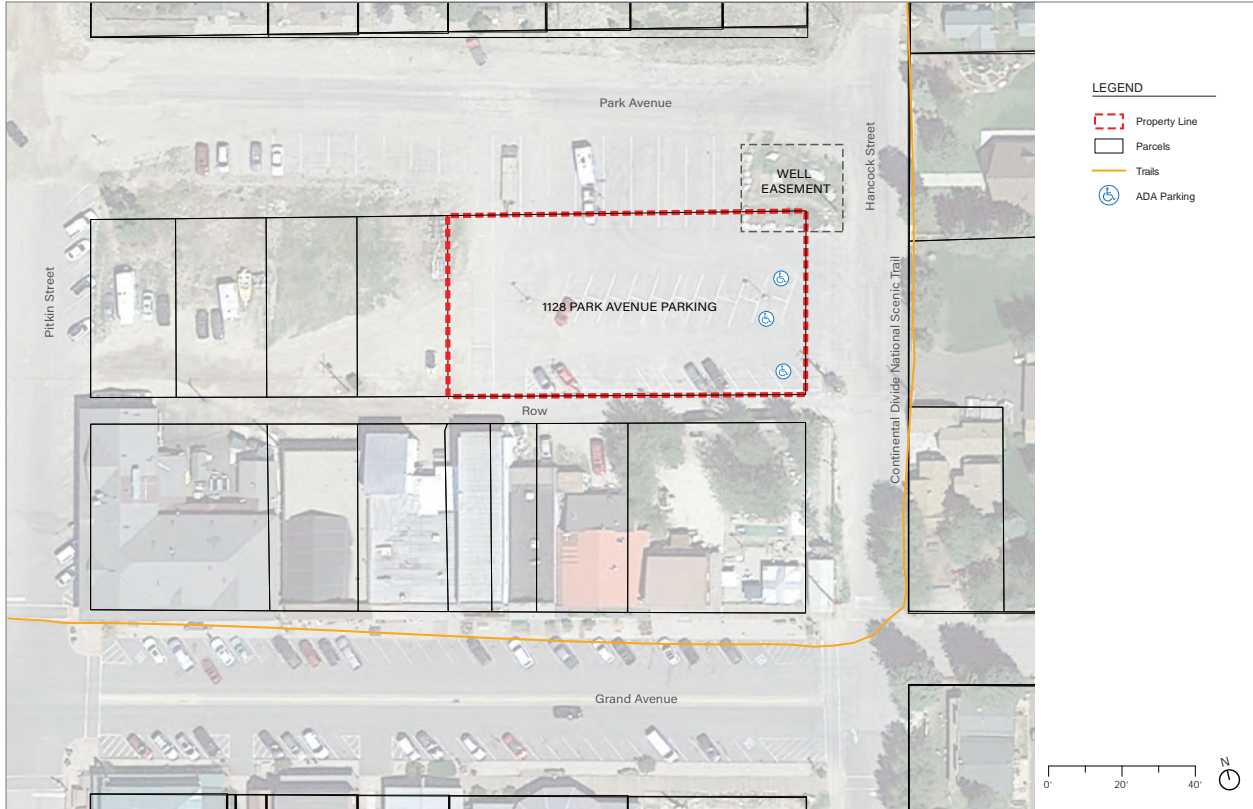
Property 14: 1128 Park Avenue Parking Lot-Future Art Space Existing Condition
